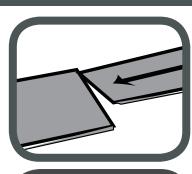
Second plank, first row. Place next floor board tight to the short end of the first plank in the corner.
